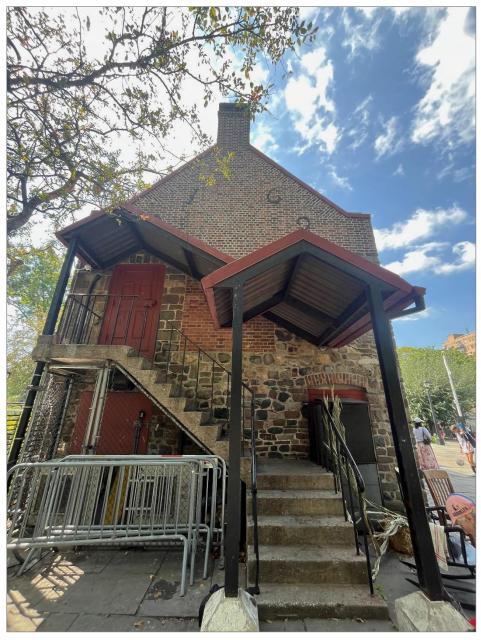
Present-day north façade, which was originally the west façade. The 1930s pavilion was attached to this façade. The fire escape is a later addition. This façade will be impacted by the upcoming addition and renovations and will be the site of the new accessible entrance. View south.
